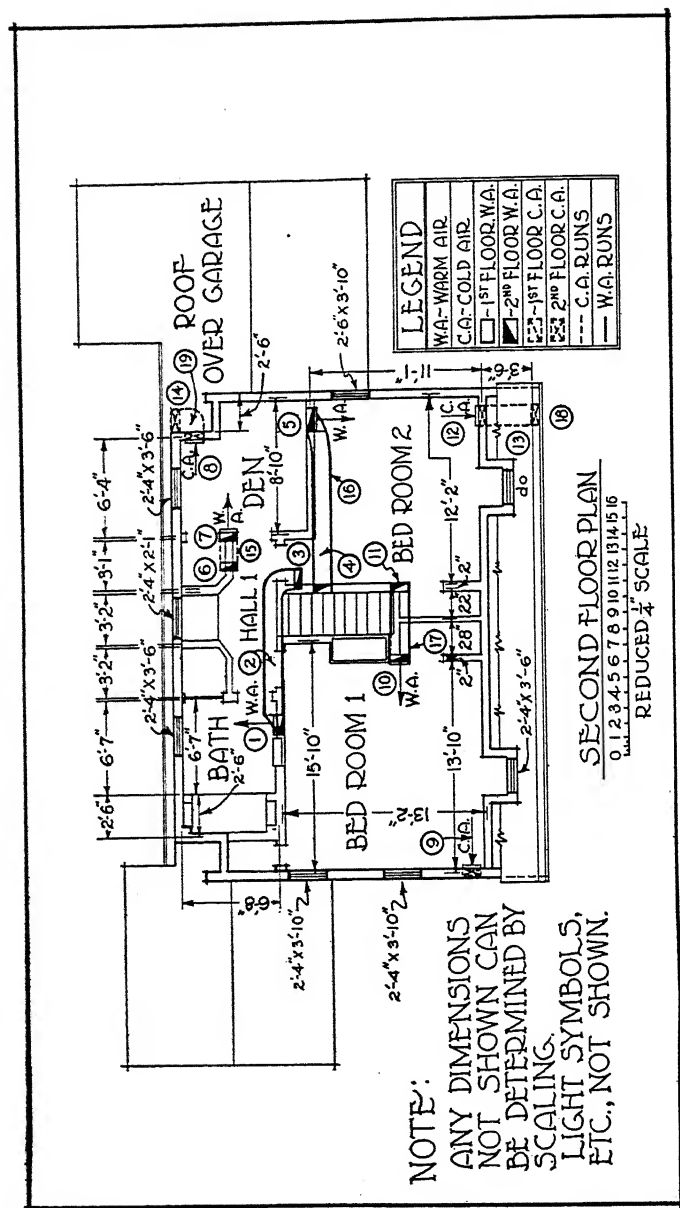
Second Floor Plan Showing Warm- and Cold-Air Registers
